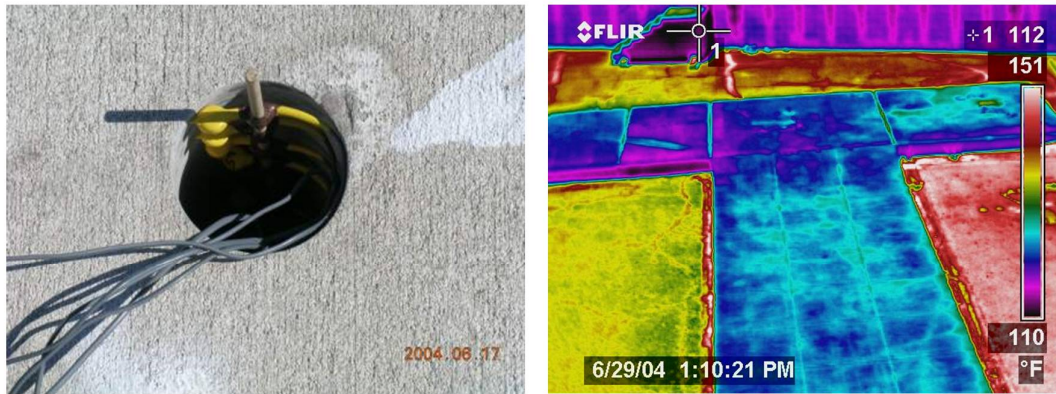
Testing and IR Image for the Concrete Pavements Mixes at June 29, 04
